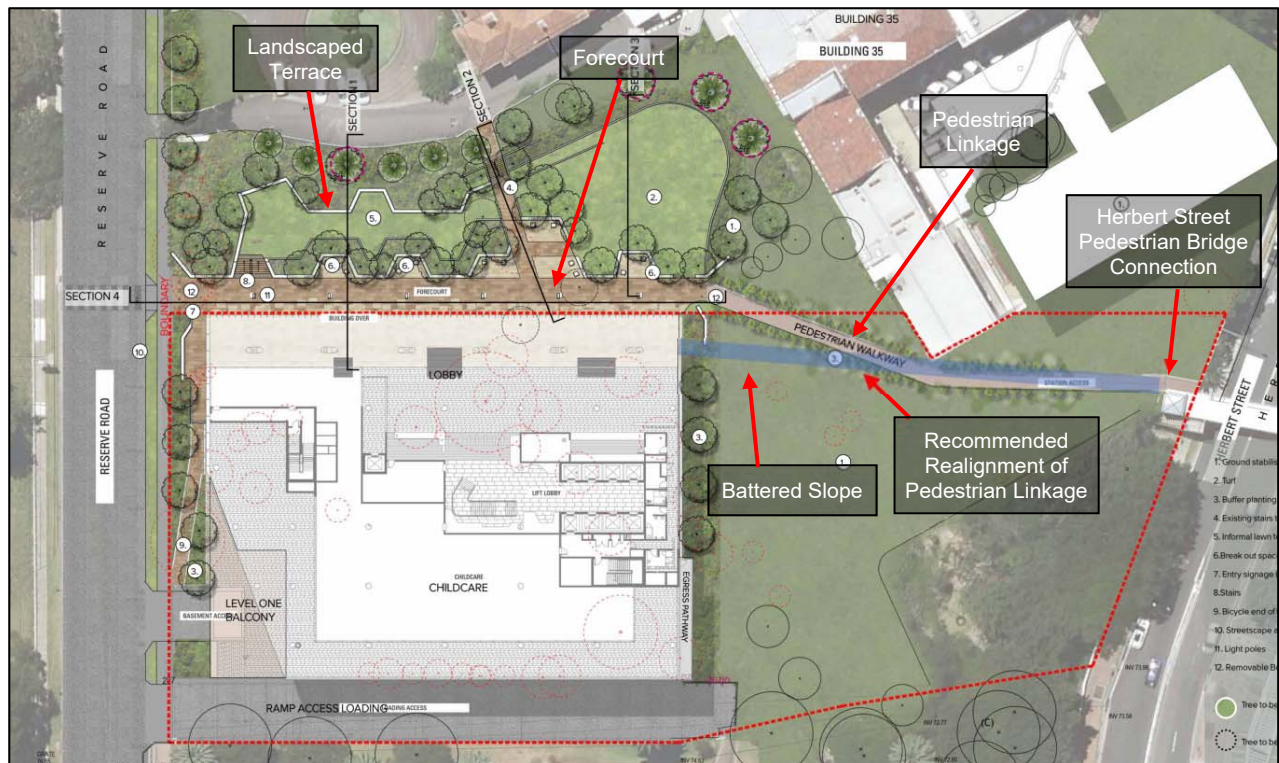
Proposed Landscape Plan (source: Applicant's EIS – Arcadia)
